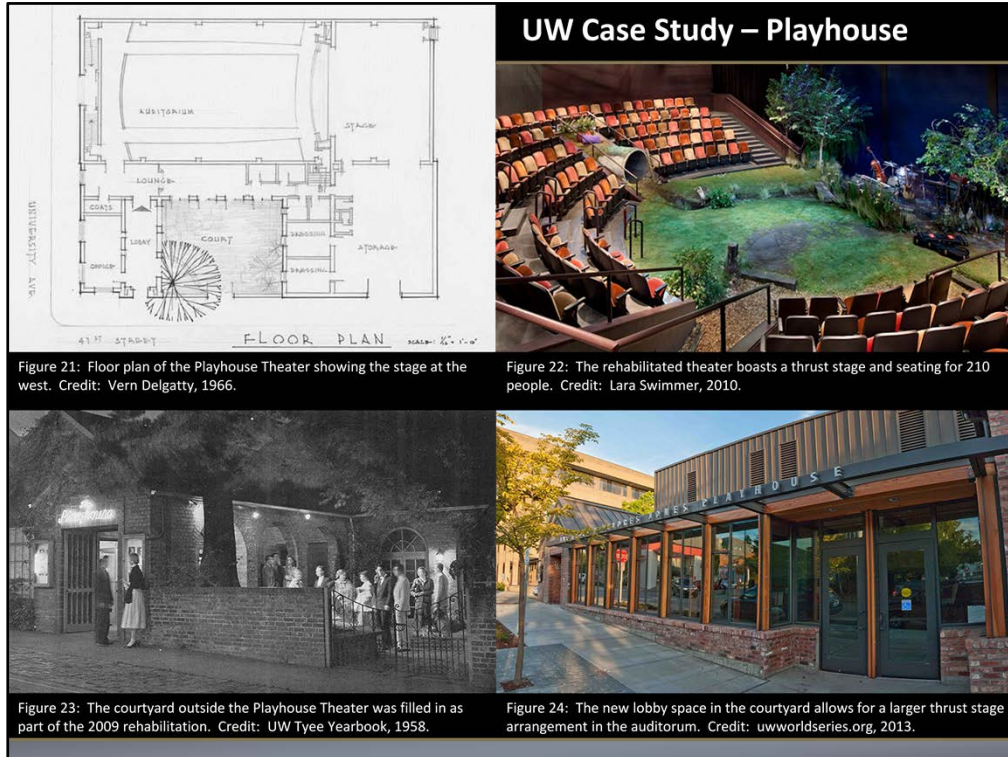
Floor plan of the Playhouse Theater showing the stage at the west. Credit: Vern Delgatty, 1966.
